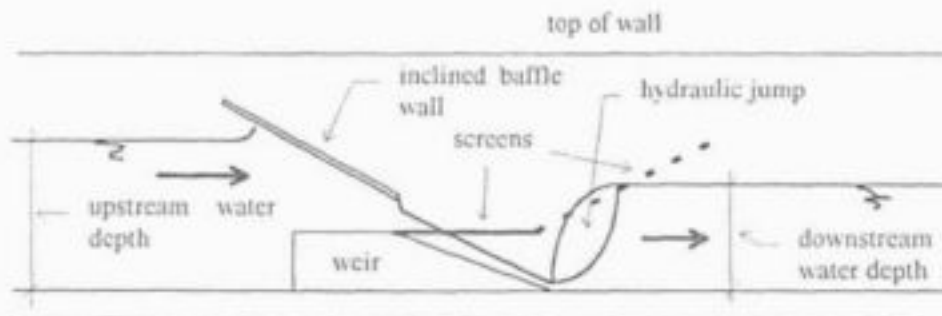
Long-section through the Compion structure showing the inclined suspended baffle wall
